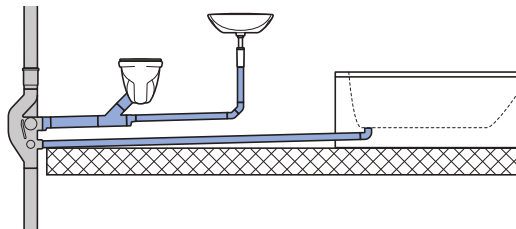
Structure with collector branch discharge pipe and single branch discharge pipe
